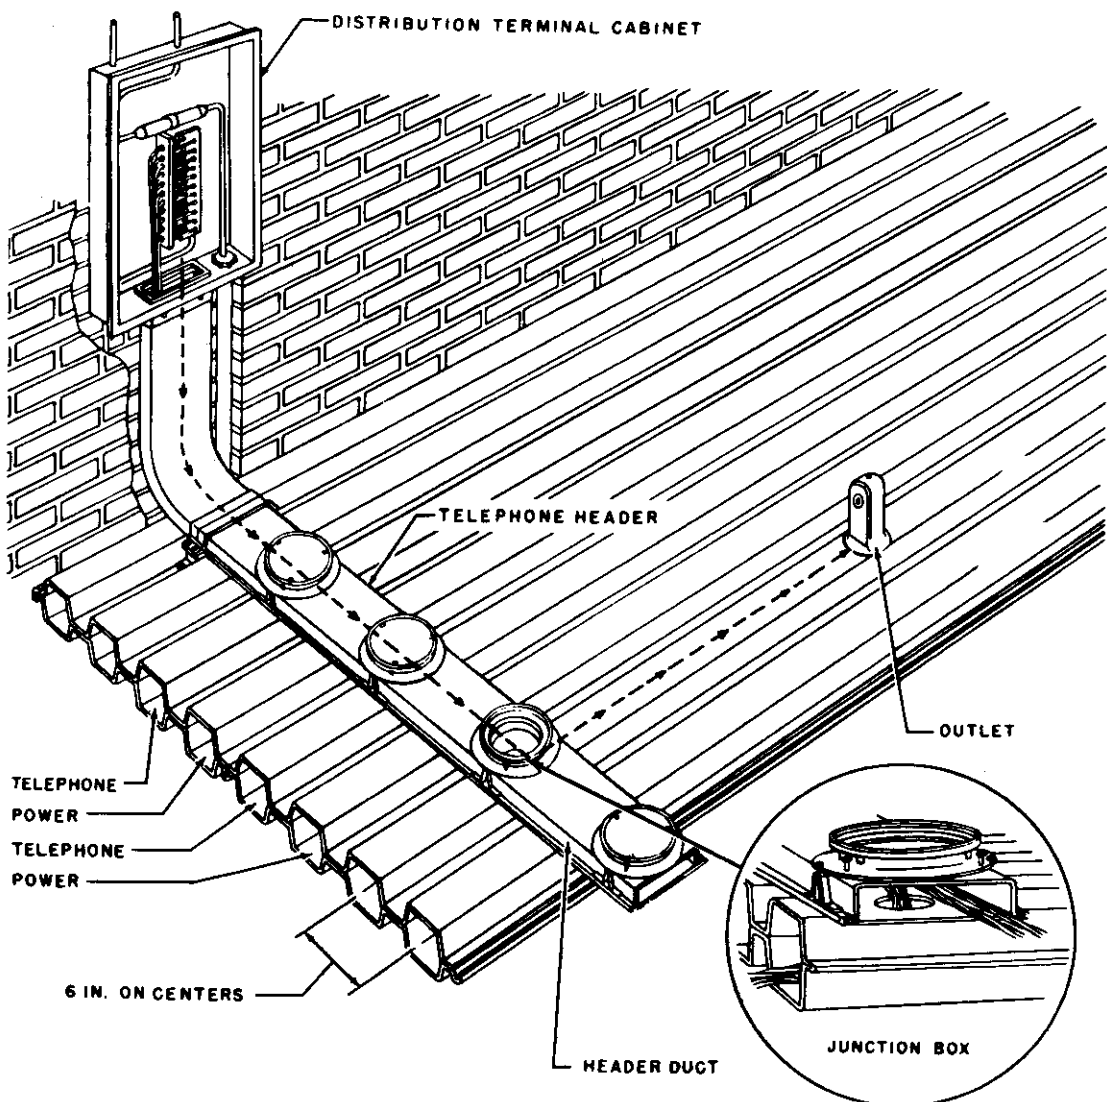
Underfloor Duct, Cellular Steel Floor Type
